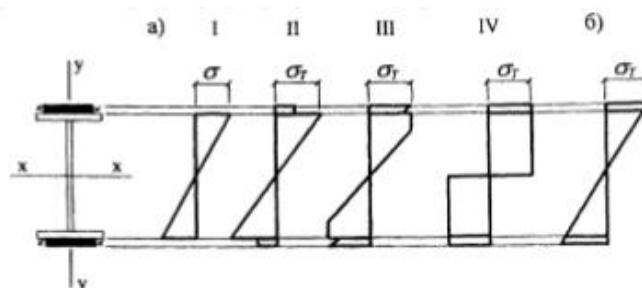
1-4 stages of stress: a - reinforced under load; b - stress plot, accepted for calculations
